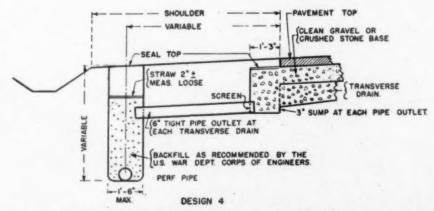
Combined subdrainage and base drainage; may be advisable where pavement may be widened
